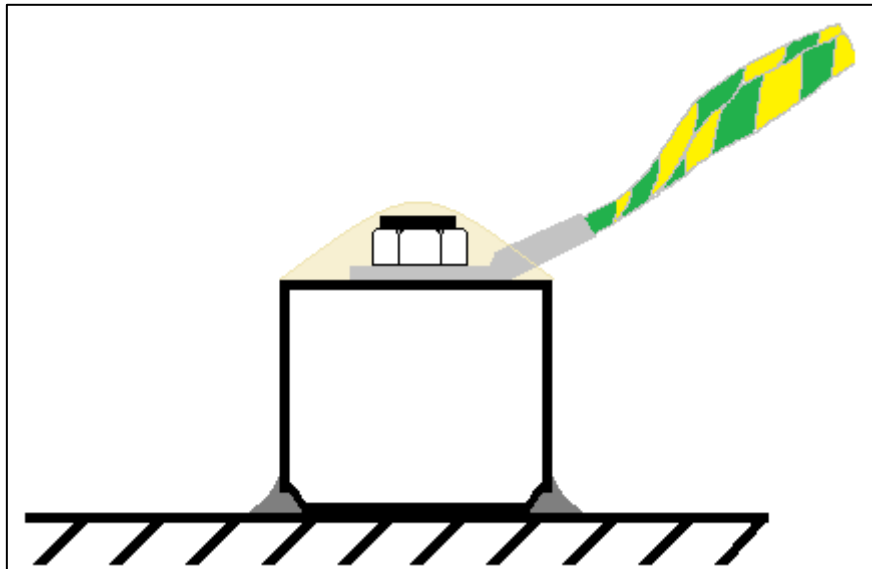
Grounding connection to structure through a welded earth boss. On earth boss top is represented the protective coating against corrosion.
